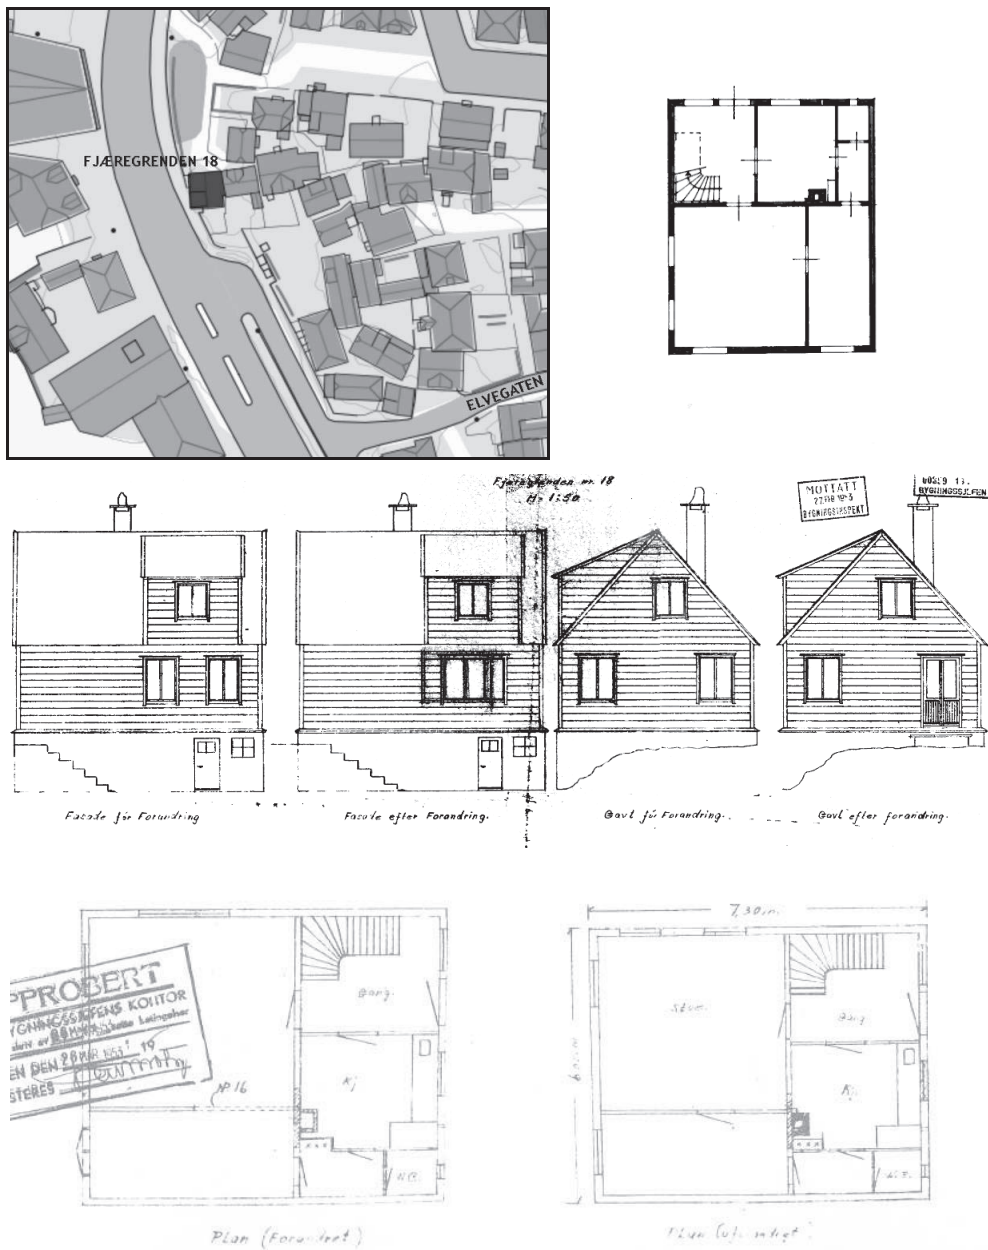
Fjæregrenden 18, site plan (top left) and floor plan (top right); plan from the master carpenter showing façade and floor plan after (centre and bottom, left) and before (centre and bottom, right) alterations in 1953. The changes in 1953 included removing a section of the dividing wall between the sitting room and chamber, inserting a triple pane window in the place of two older windows on the west end façade, and replacing two windows in the gable, one with a garden door. Bergen 18 – 2 – 1953 (August Schmidt 2010; Bergen municipal building archive)
